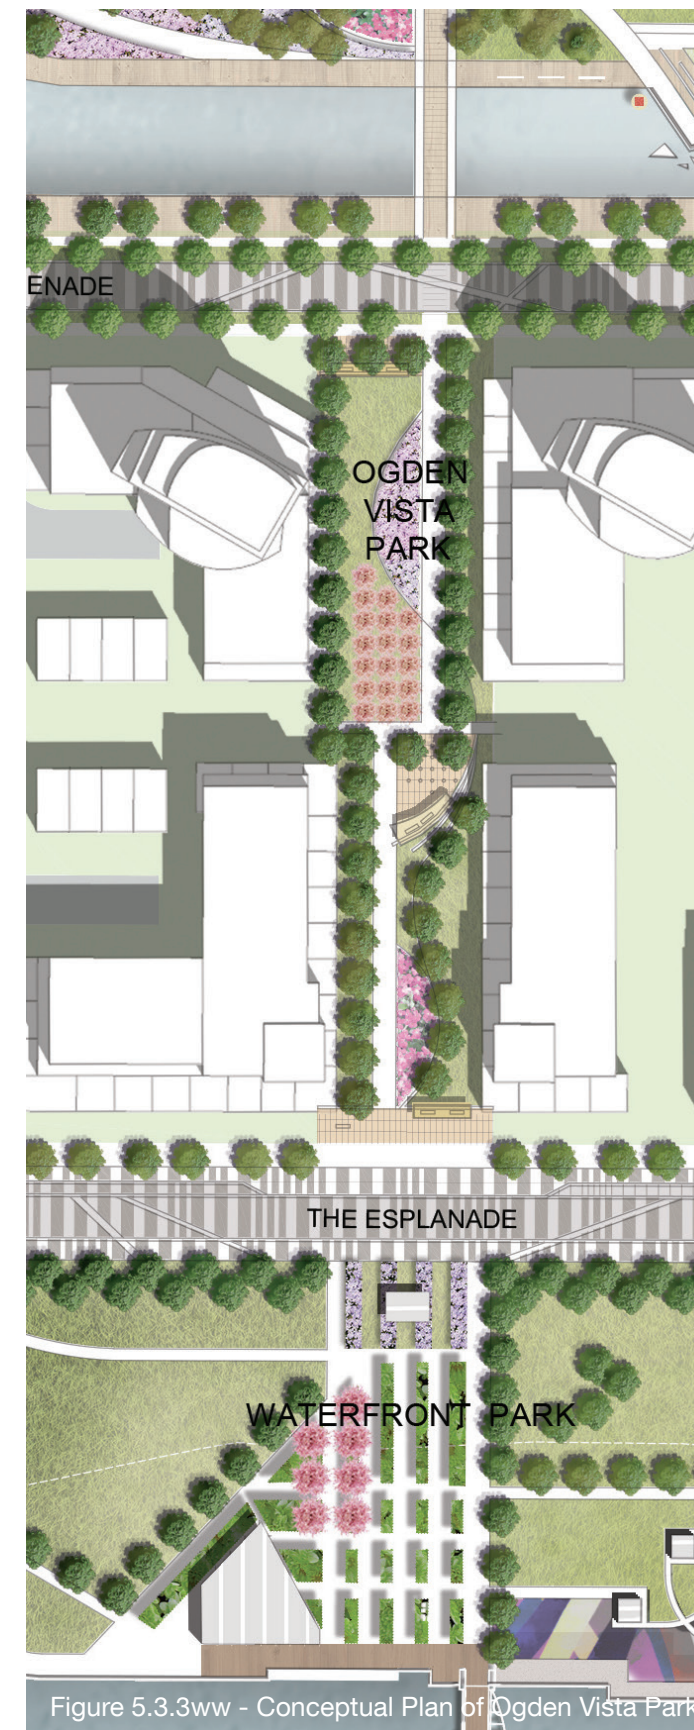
w - Conceptual Plan of Ogden Vista Park
